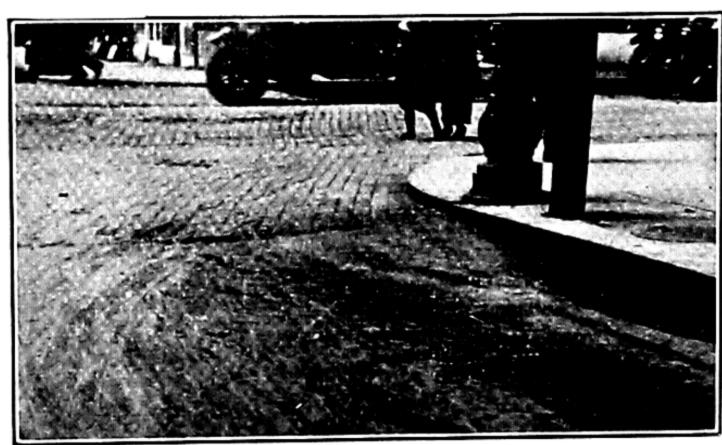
Showing intersection pavement warped up to the top of the curb at the cross-walk.
